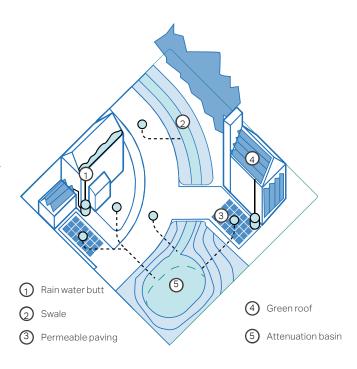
Diagram showing the best use of harvesting water systems rain garden, swales, permeable paving, green roofs
